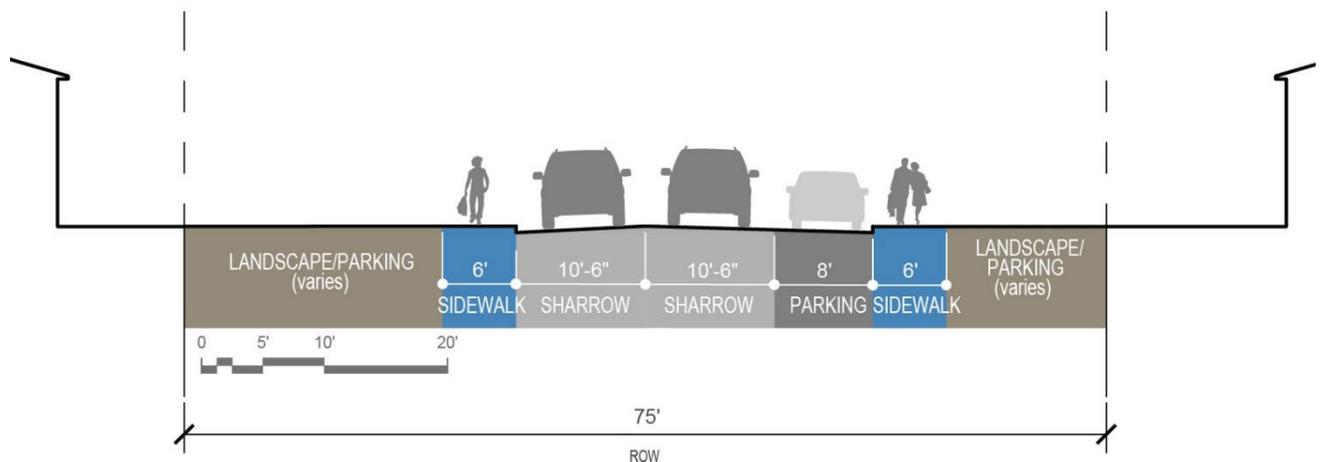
Proposed cross-section D– Quinn Ave from 1st St Bypass to 4th St (looking north)
